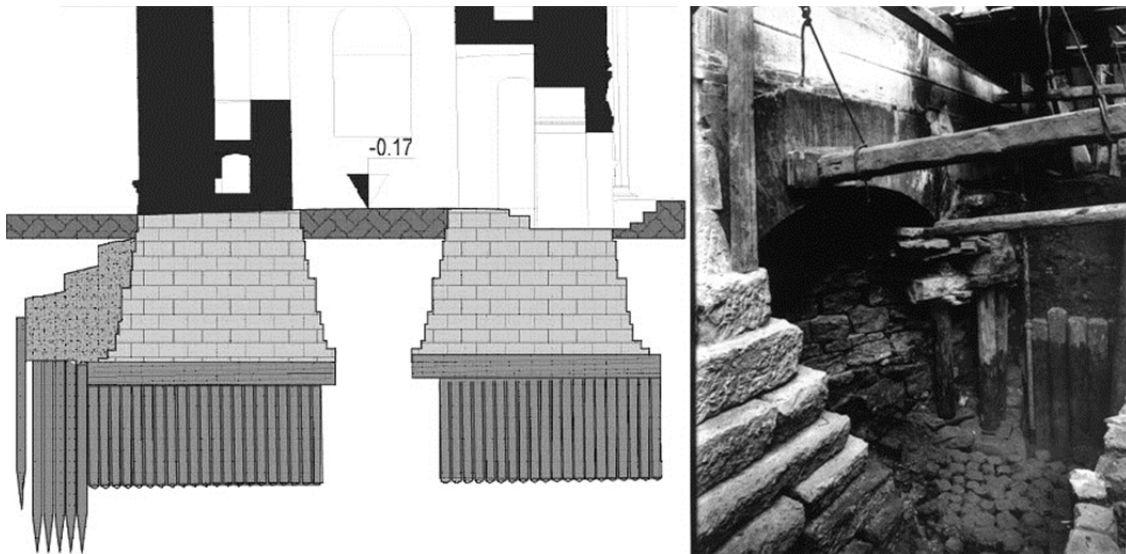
Strengthening intervention on the foundations of the Frari bell-tower at the beginning of the 20th century..
